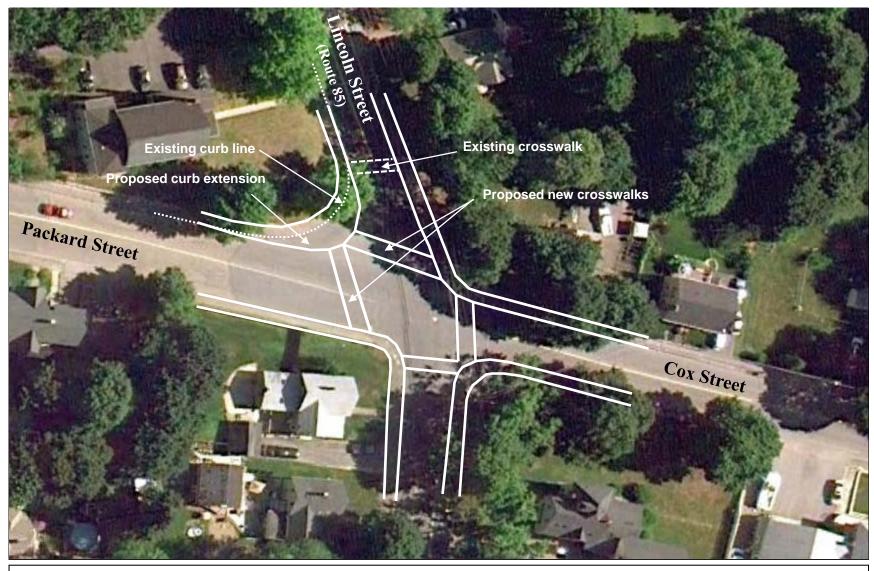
shows the proposed curb extension and new crosswalks. ¹³ At this preliminary planning stage, the total cost of the signal installation and the intersection reconstruction can be roughly estimated to be around \$1,000,000, assuming that there would not be any land-taking costs. Currently, Lincoln Street (Route 85), Packard Street, and Cox Street are owned by the Town of Hudson. The implementation would require the town to work closely with MassDOT through the project implantation process (see Appendix G). The Town can prepare the Project Need Form (PNF) and Project Initiation Form (PIF) for improvements to be implemented at this location, as
